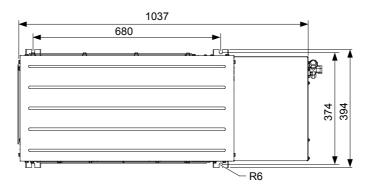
Installation hole dimensions of Low-Temp outdoor unit base (top view, unit: mm)
